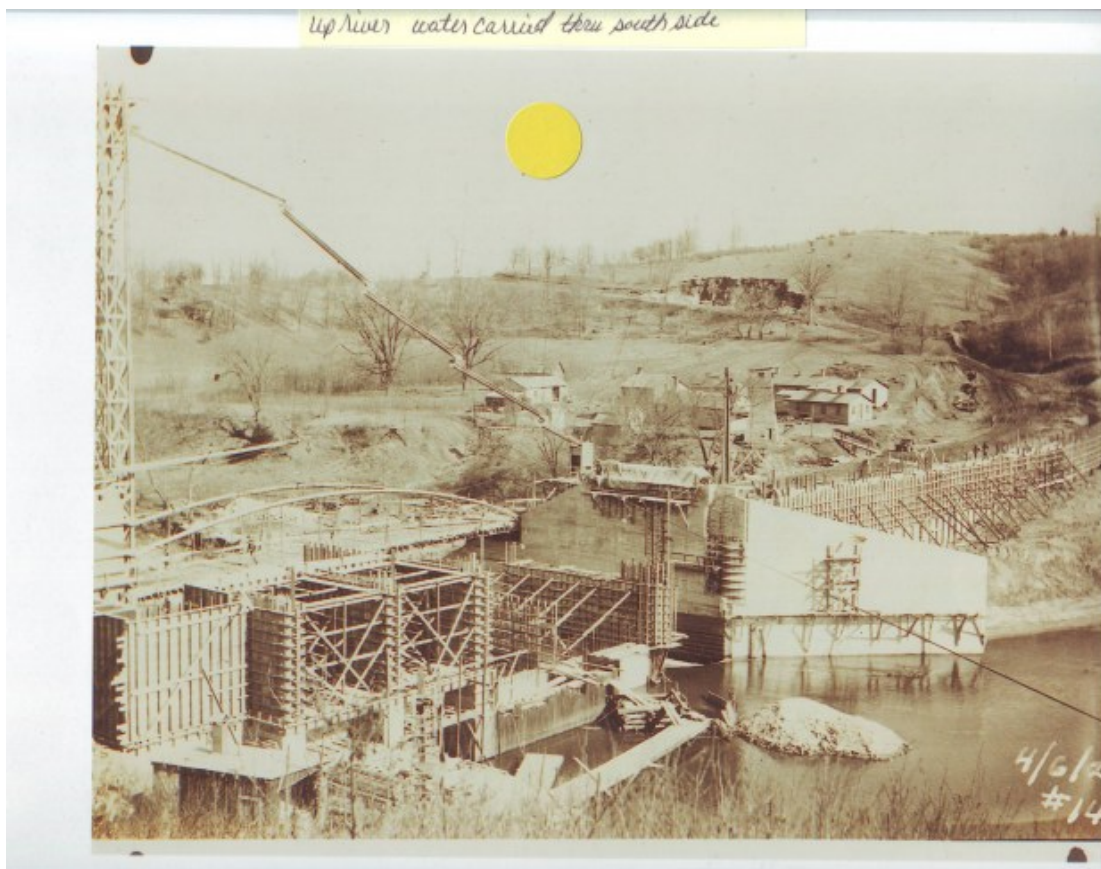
Historic construction. Borrow area and core wall construction shown. Source: LDRA
